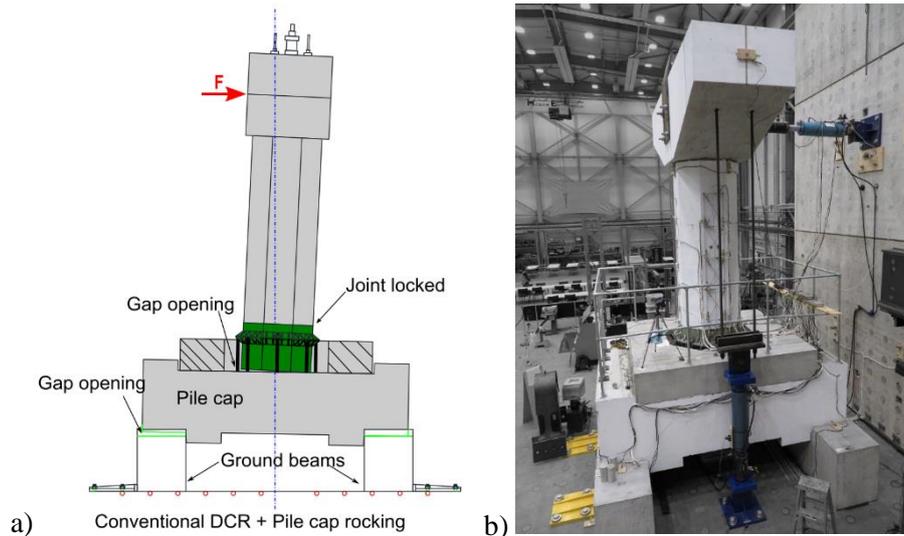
a) Schematic of specimen in the deformed state showing locations of rocking joints. b) Side view of specimen
